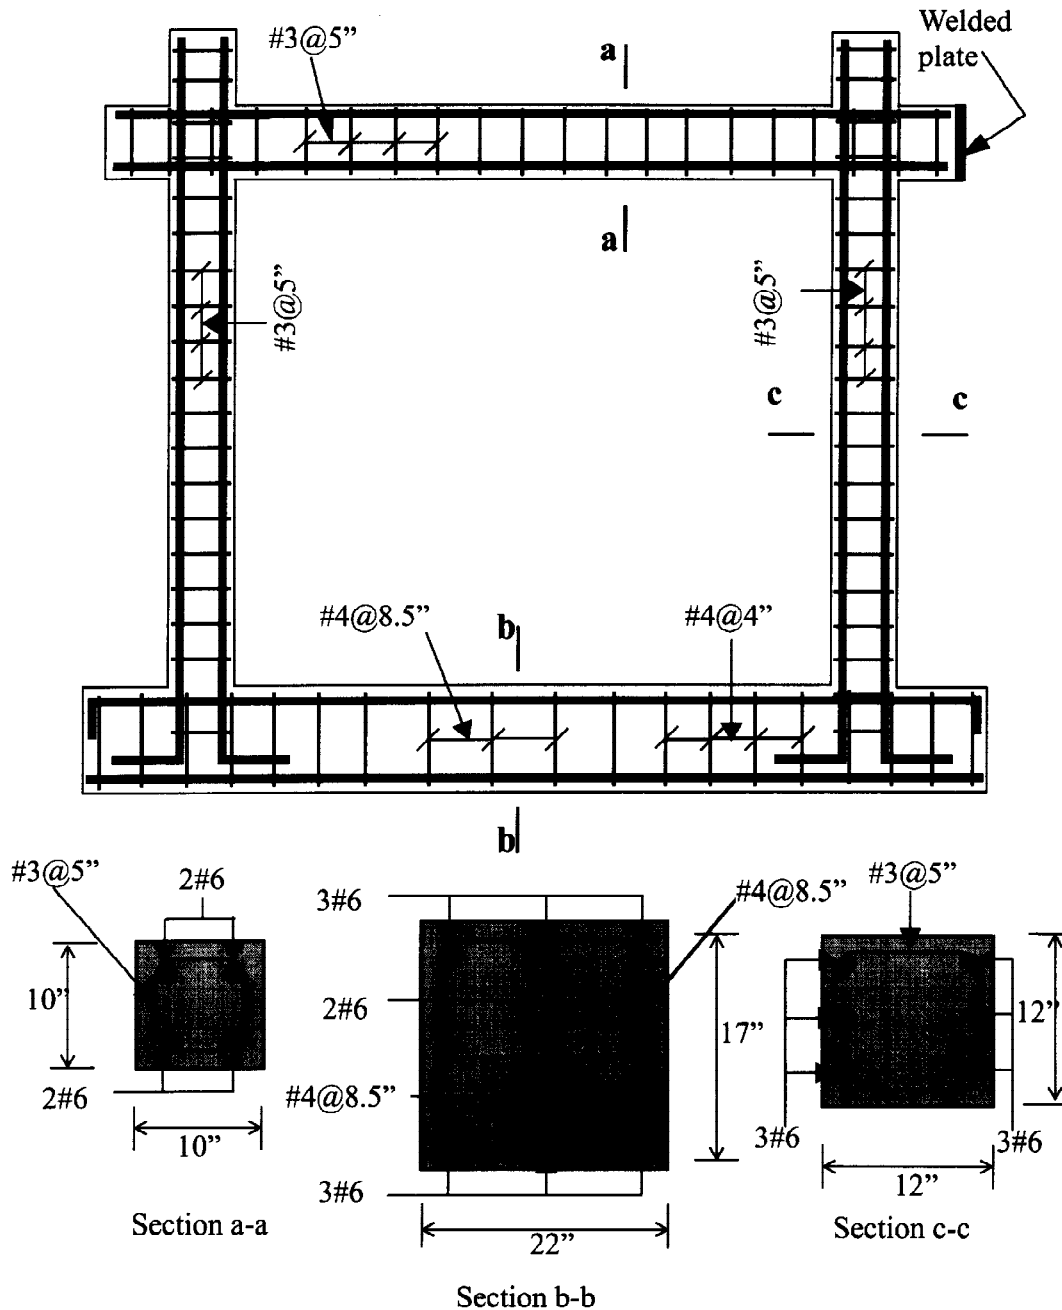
Reinforcing Detail for Typical Frame Specimen
